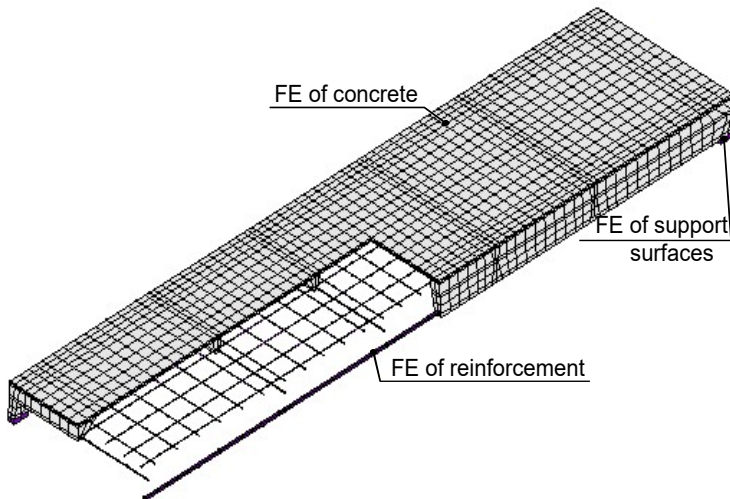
Finite-element diagram of a reinforced concrete ribbed slab with support surfaces
